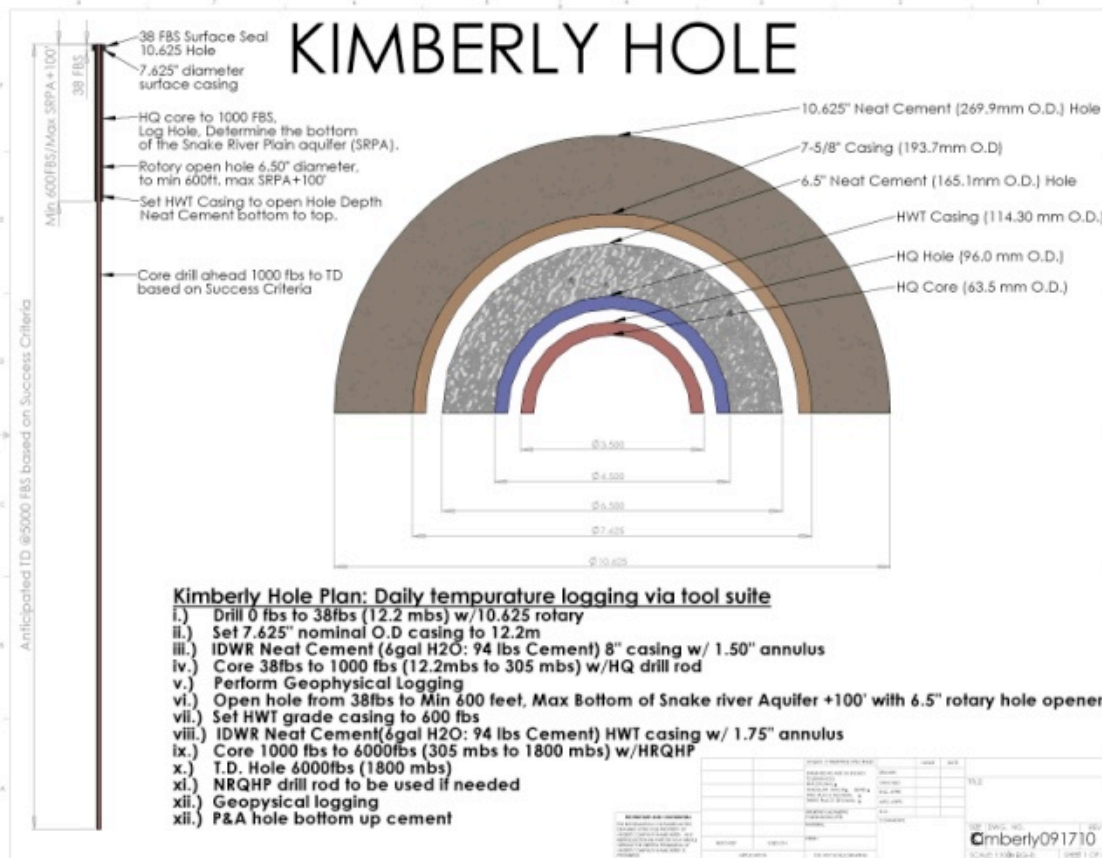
Kimberly Hole Plan to 6000 feet.
